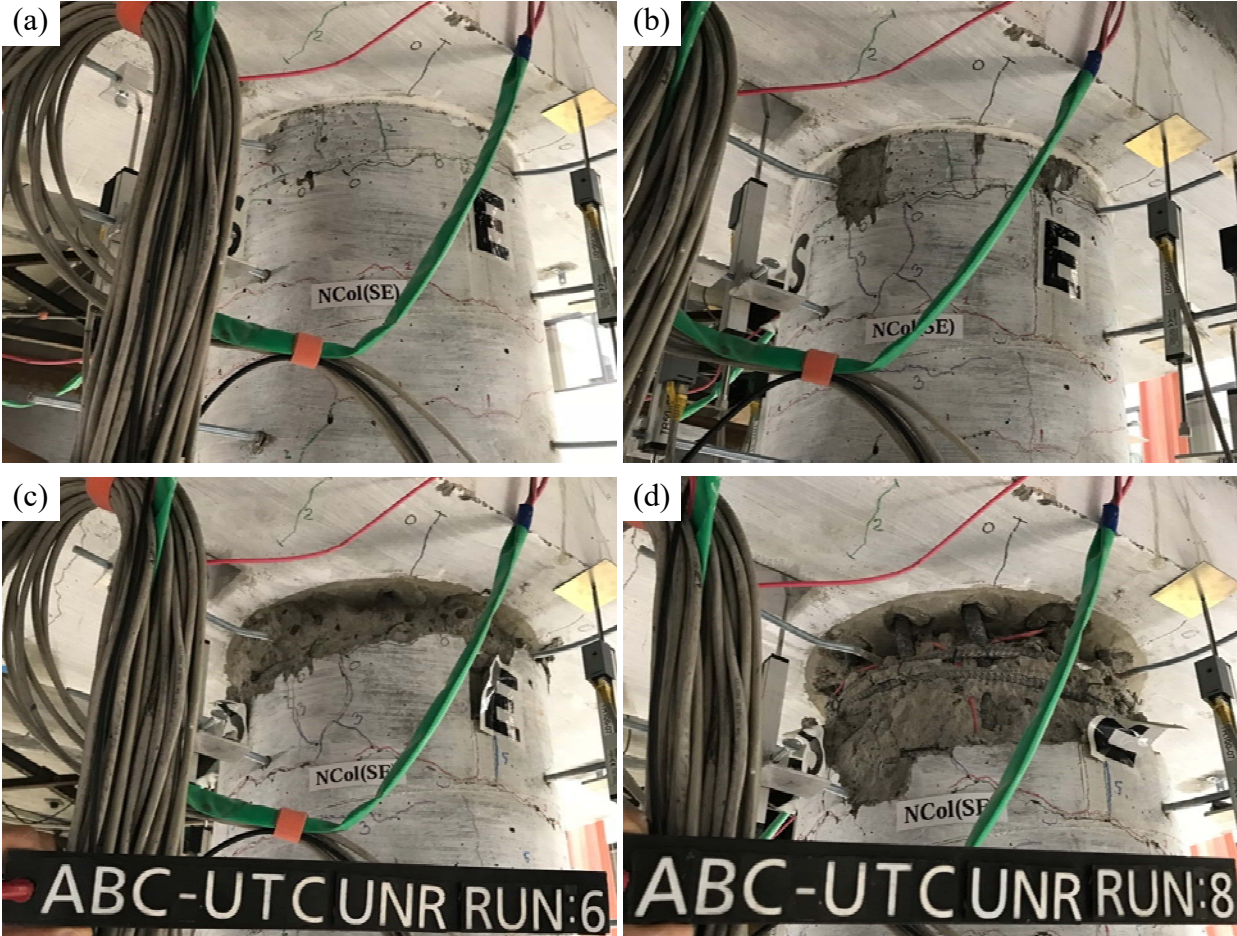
Damage progression in the north column, southeast side: (a) Run 2, (b) Run 4, (c) Run 6, (d) Run 8 (Images by Elmira Shoushtari)
